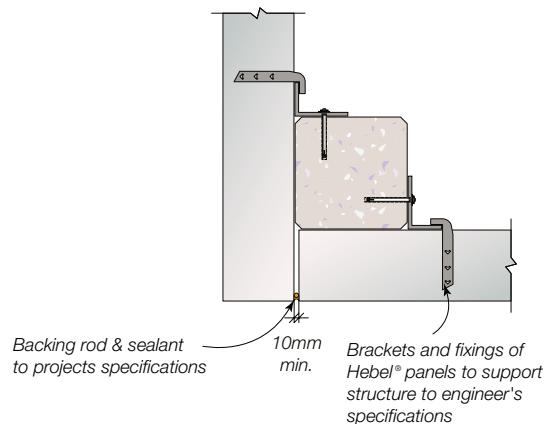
Horizontal wall panel & steel support - corner detail (plan).
